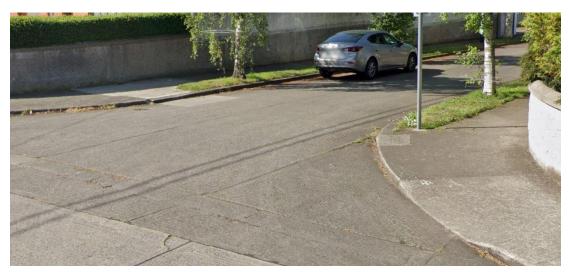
Uncontrolled Crosspoint at Hazelbrook drive
